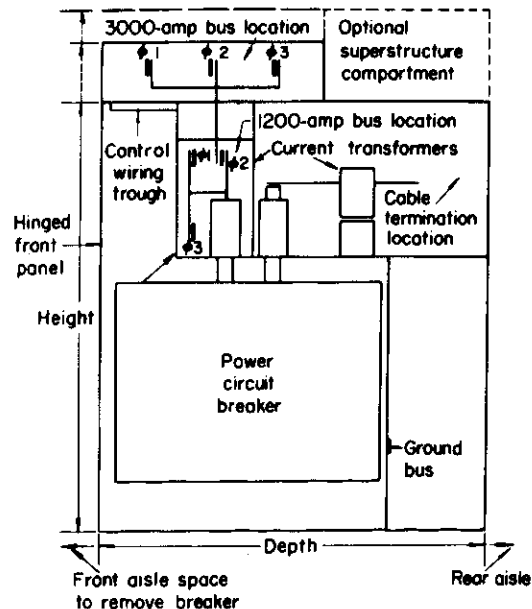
Indoor Metal-clad Type M-26H, 350 MVA
